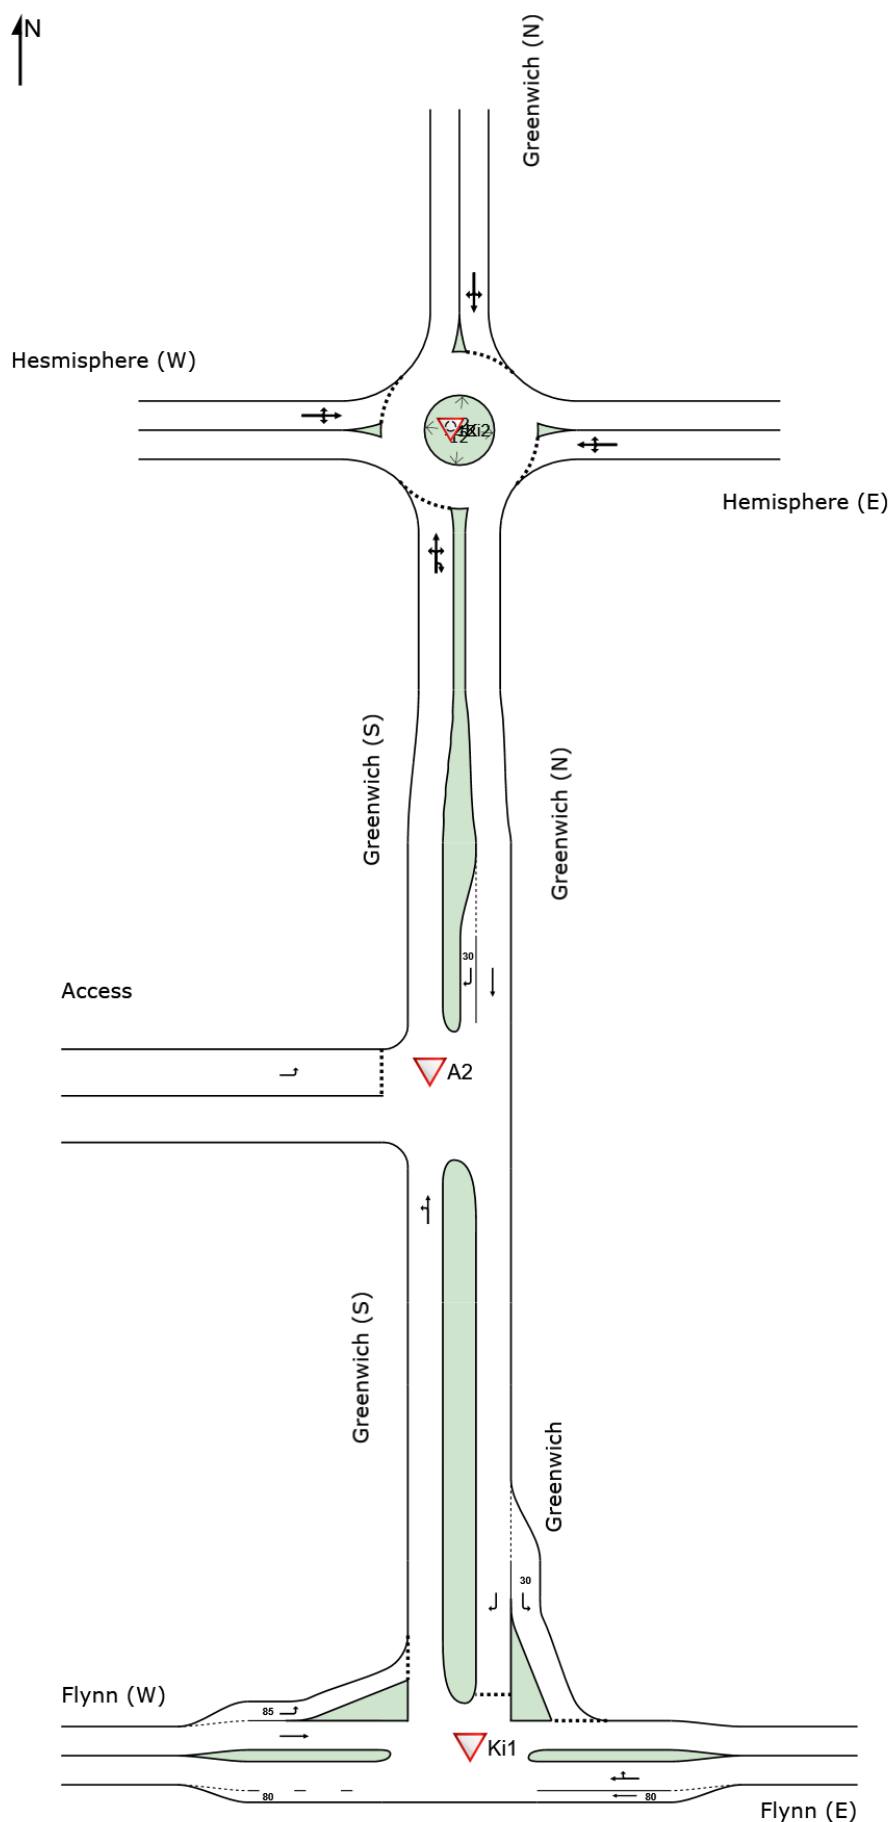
Proposed Development SIDRA Intersection 9.1 Network Model layout
